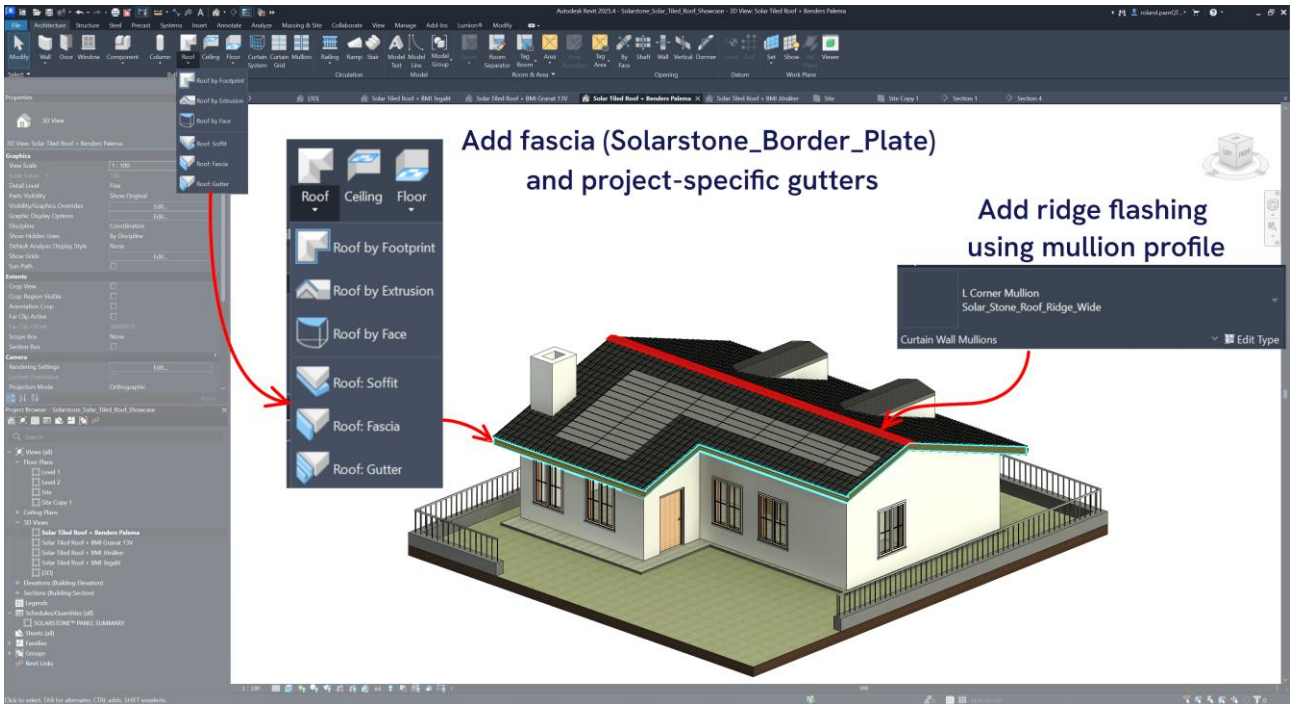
Adding roof fascia, ridge flashing and project-specific gutters to complete the roof's architectural appearance.
